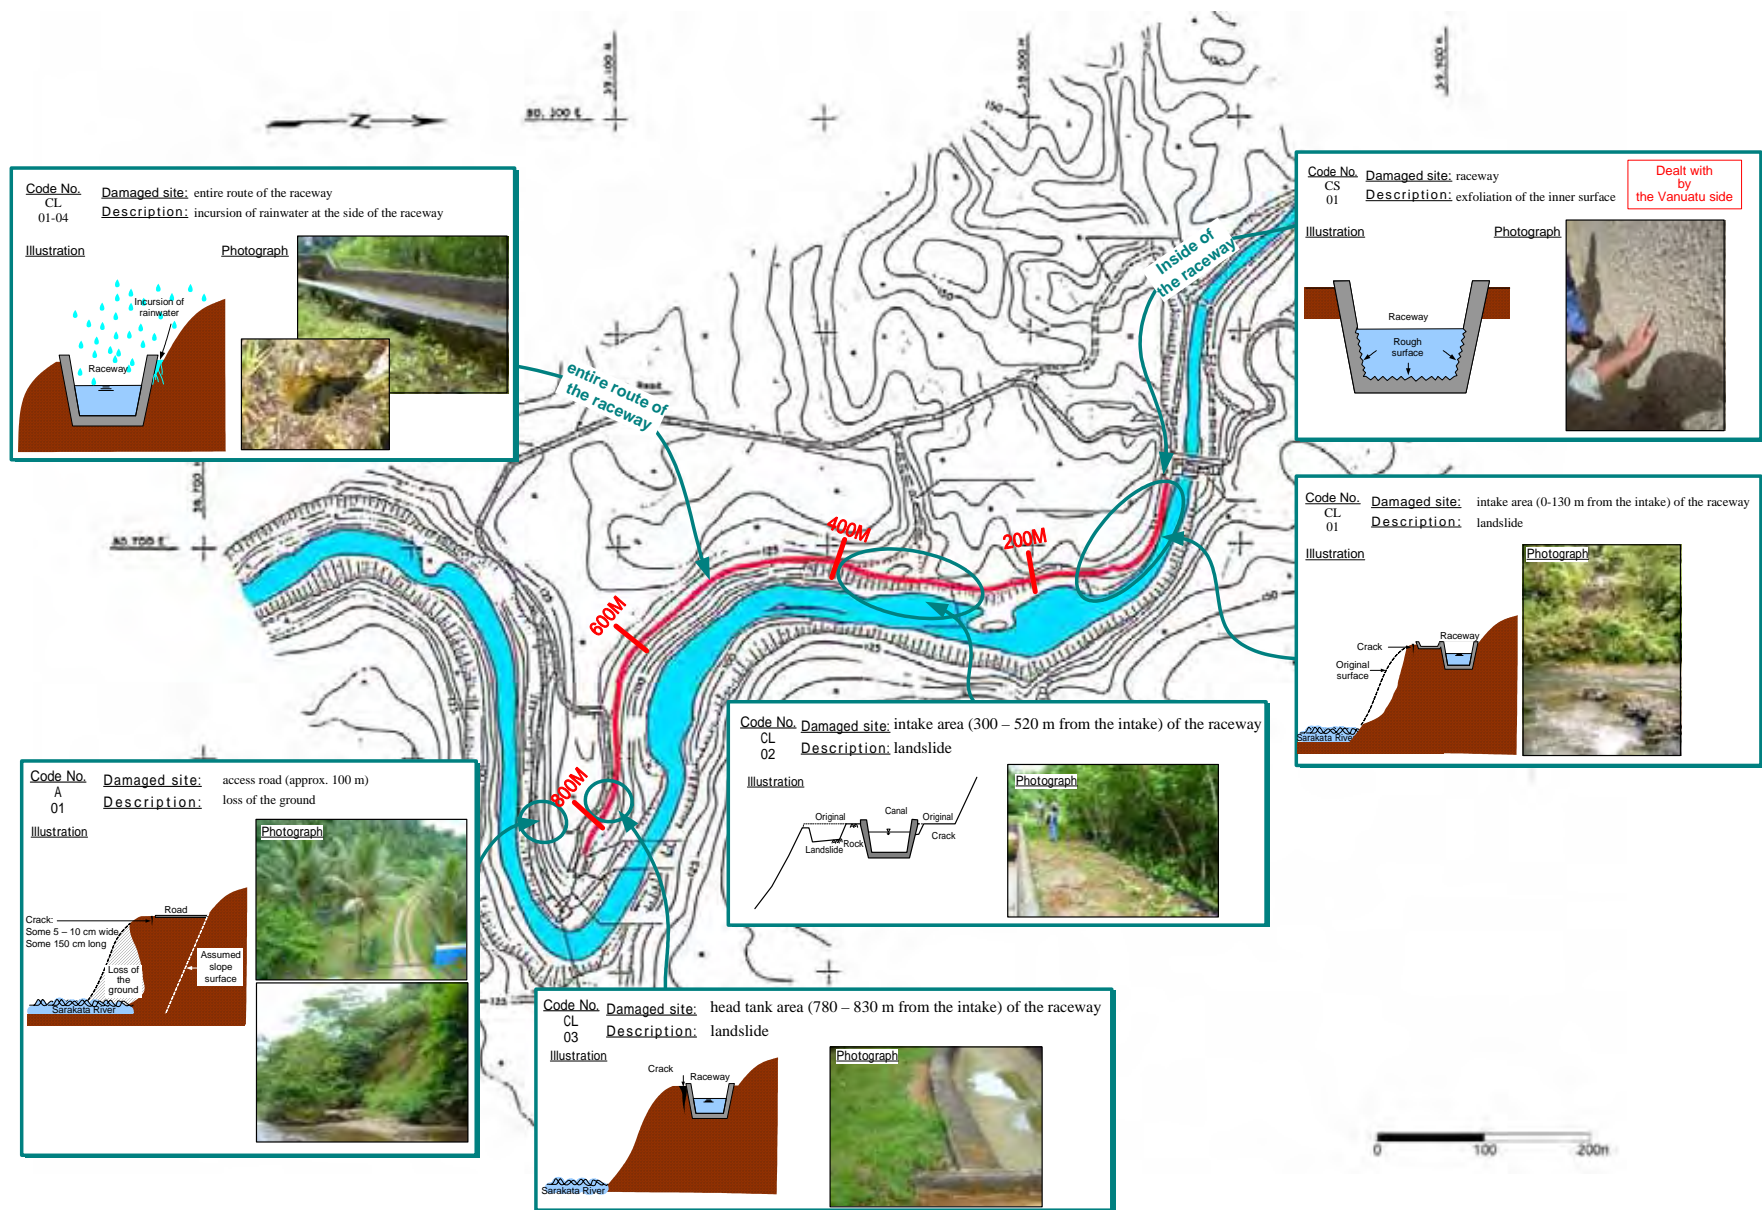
Damage Situation of the Intake Water Canal and Access Road
